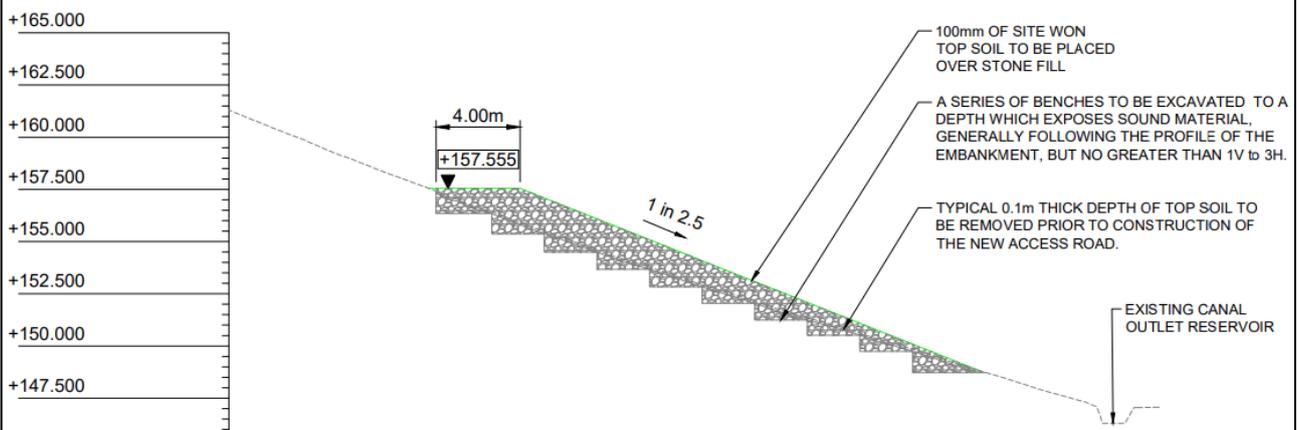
access road and crane pad general arrangement (GA sections provided below)
